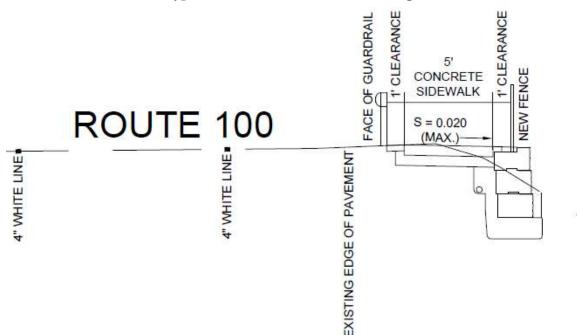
Section 1 Typical Cross Section with Retaining Wall
